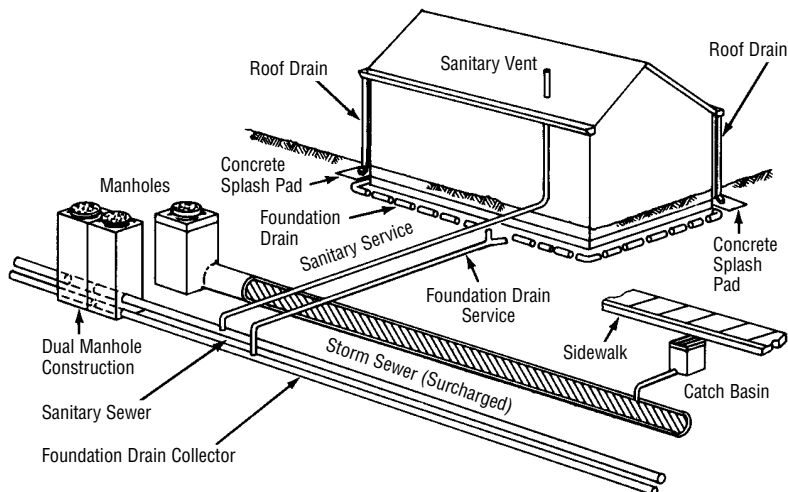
Foundation drain connected to foundation drain collector by gravity.
